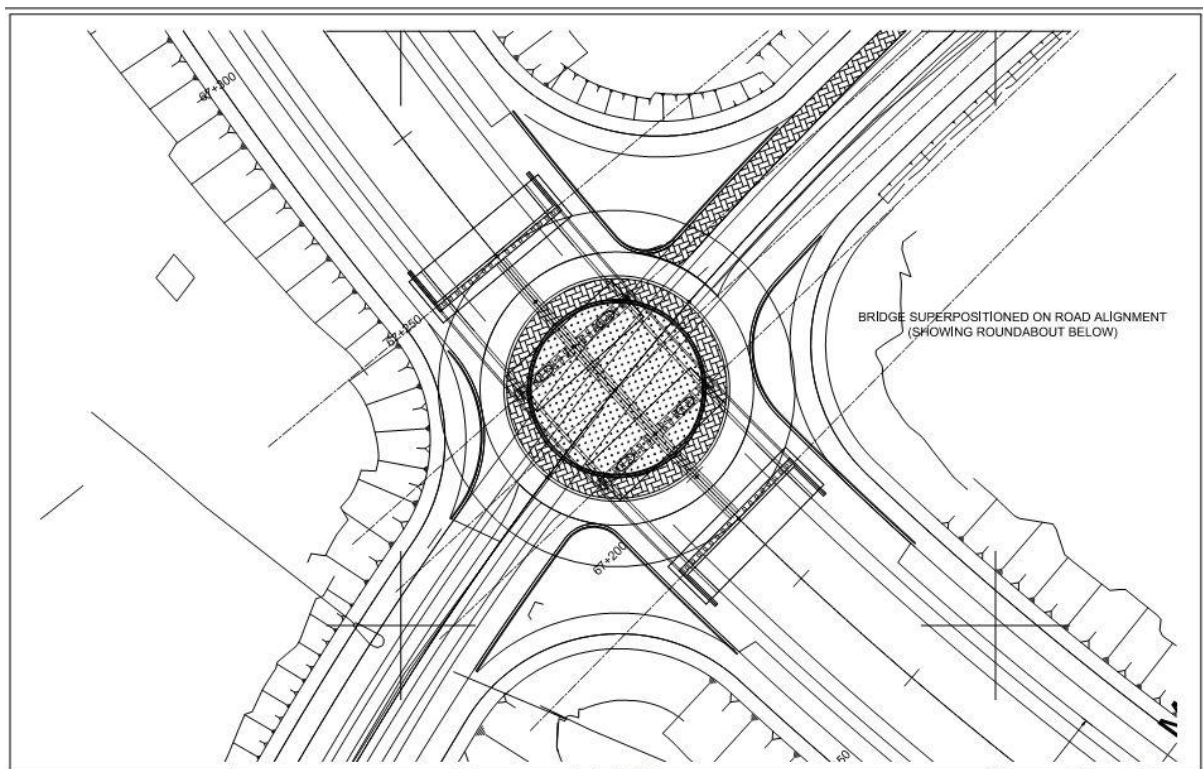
Bridge on Asikuma Jn Interchange CH. 67+ 200 for Section 3 Project Road
